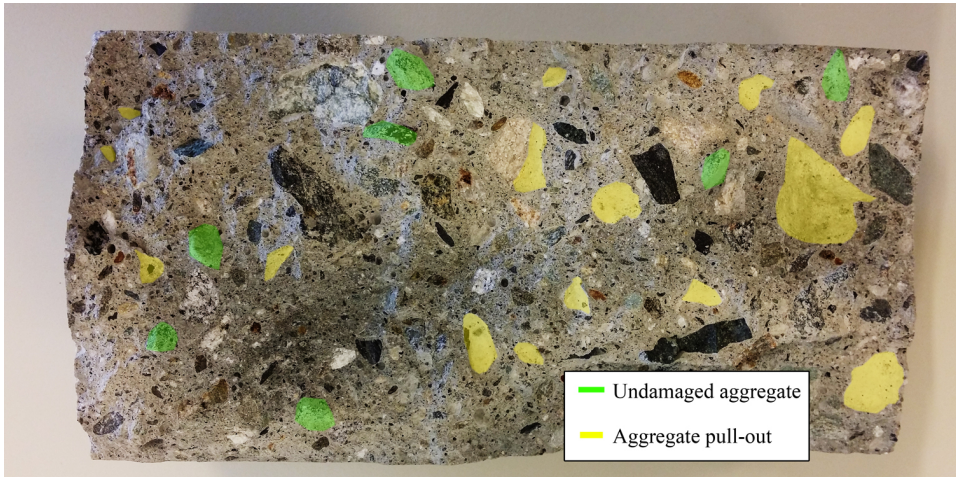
Fracture surface of tensile splitting specimen. The places where undamaged aggregate is stuck in the concrete are highlighted green, while the places where aggregate has been pulled out are highlighted yellow.
